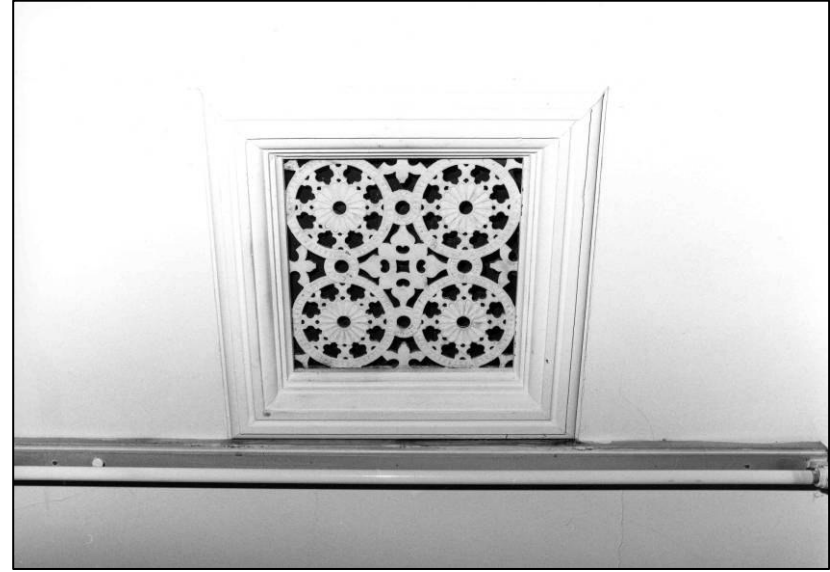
Church: meeting room (former band room), vent over ceiling (photo 9/13).
